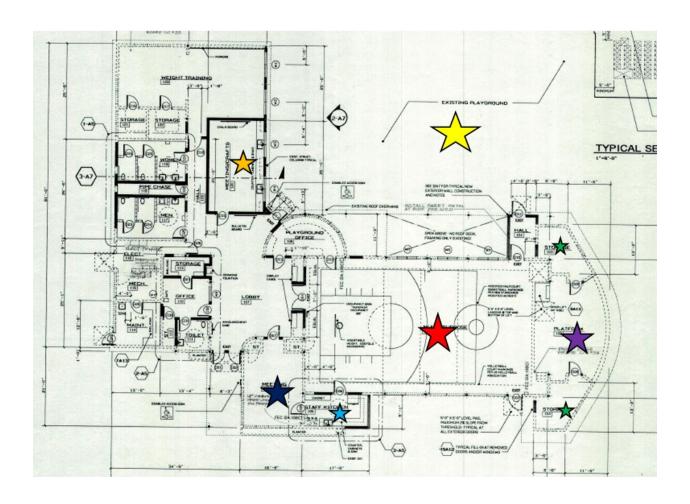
SITE PLAN- STORAGE CONTAINER LOCATION
